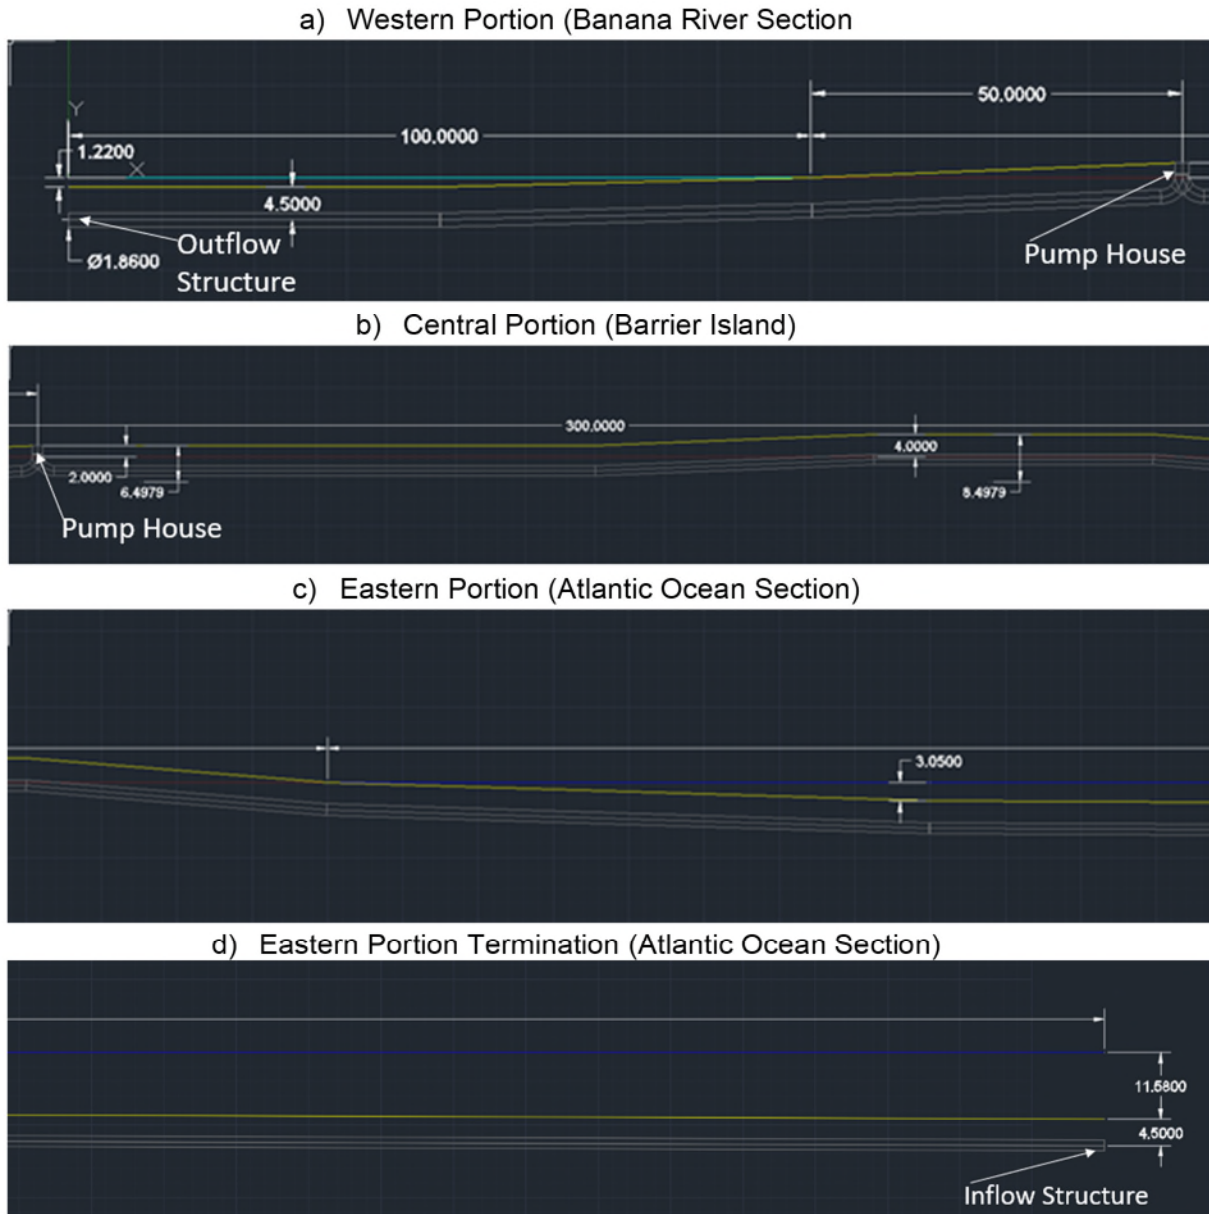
Temporary inflow pilot system side view with pump split into sections: a) western, b) central, c) eastern, and d) termination
